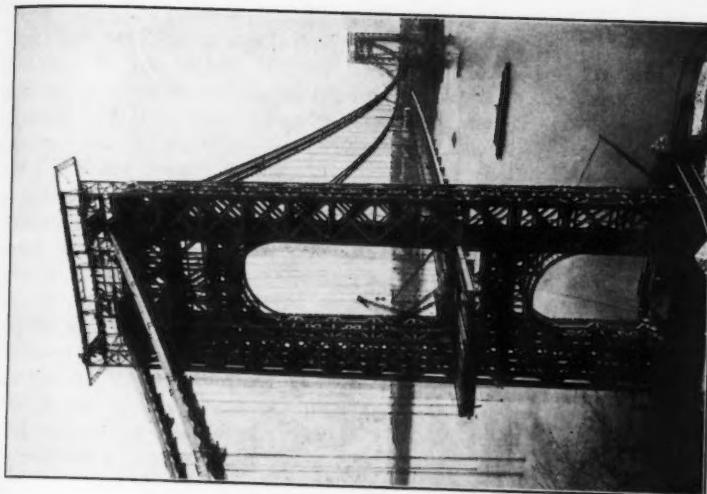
VIEW SHOWING FLOOR ERECTION.
